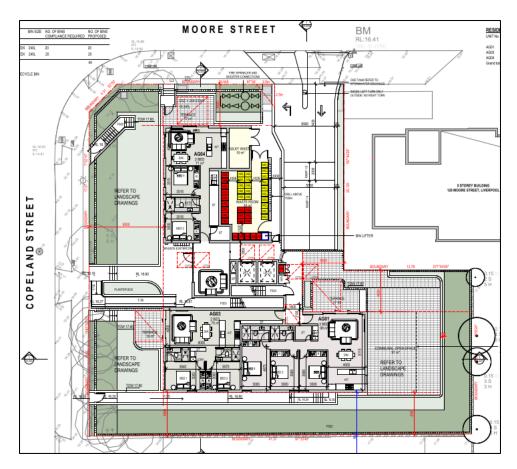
Proposed Ground Floor Plan Extract (Source: CDA Architects)
